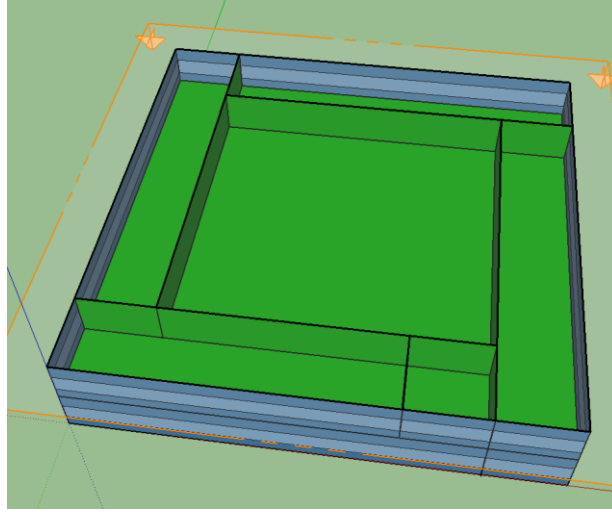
The floor plan of the preliminary study, alignment $\eta = 1/5$
